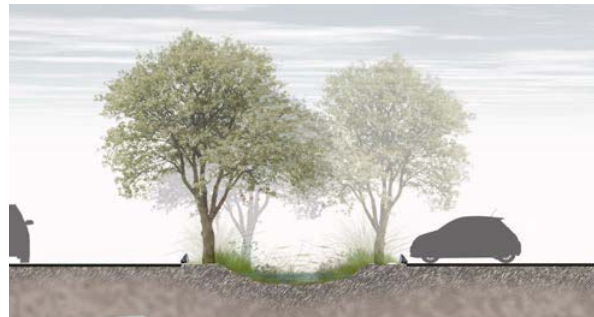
STORM WATER SWALES INCORPORATED INTO THE PARKING STREET LANDSCAPE
